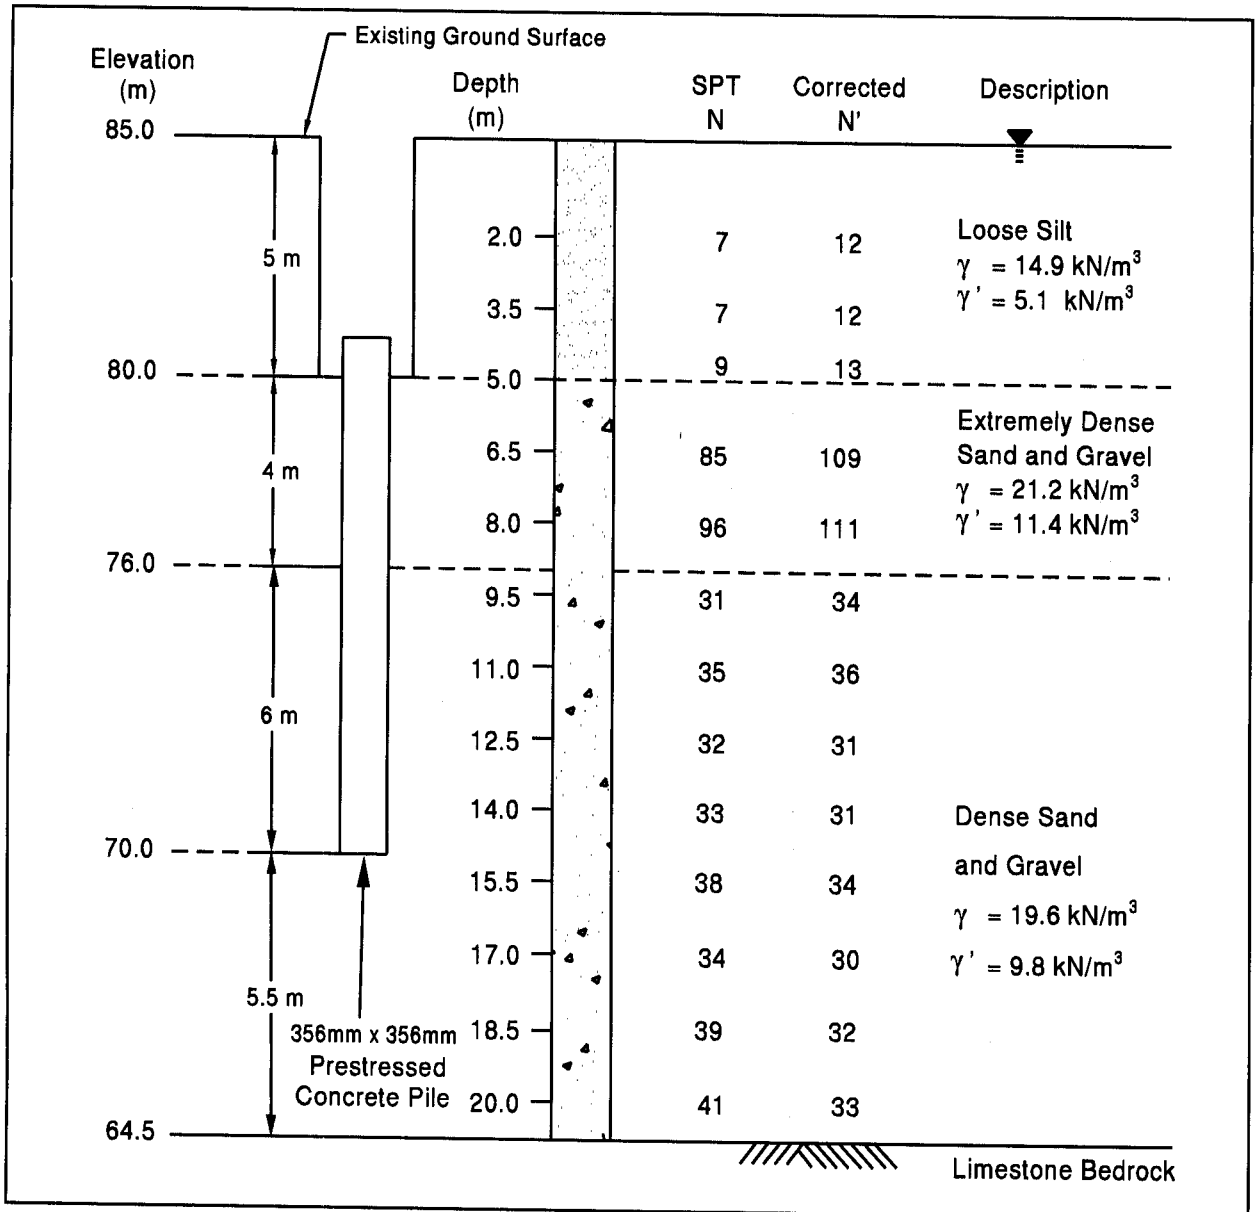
Interpreted Soil Profile from Soil Boring S-2 at Pier 2
